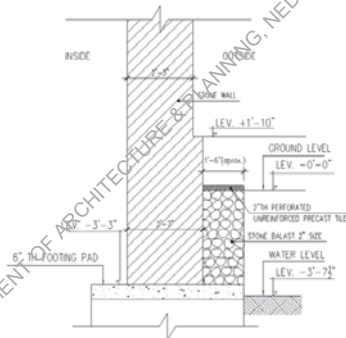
Pit Excavation near Water Filtration Plant in Courtyard
